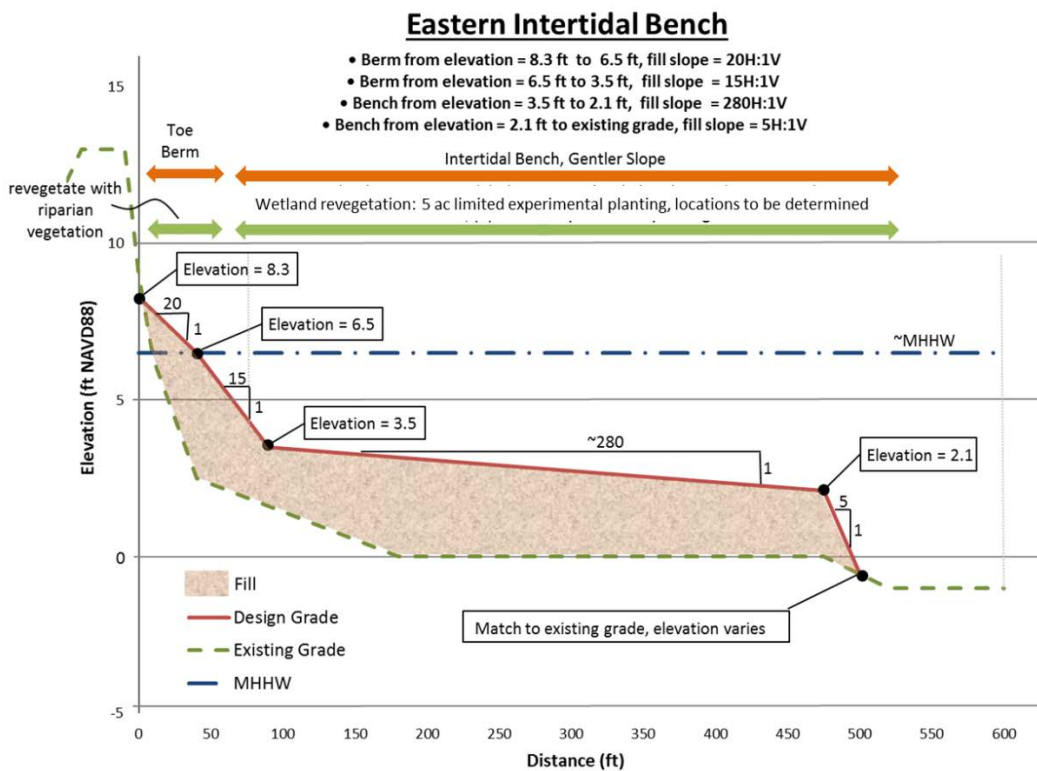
Proposed cross-section design of the eastern intertidal bench.
